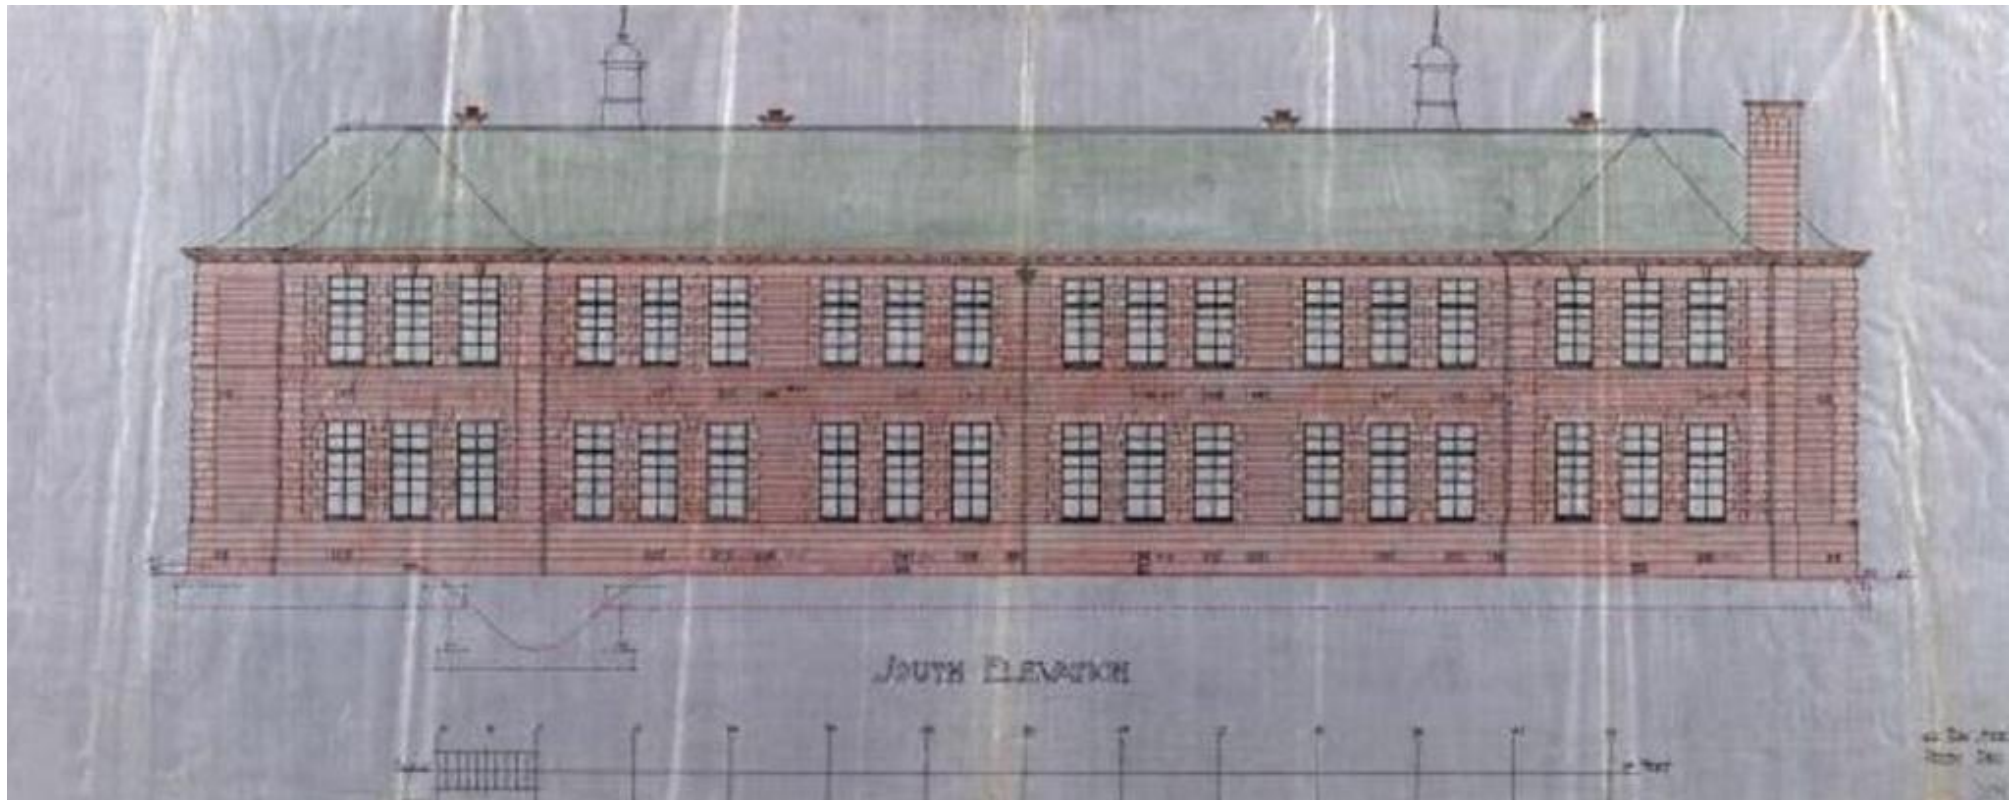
Original architects drawing of the South facing elevation of Balhousie Primary School (© Perth and Kinross Archives E/MP/P/115).
